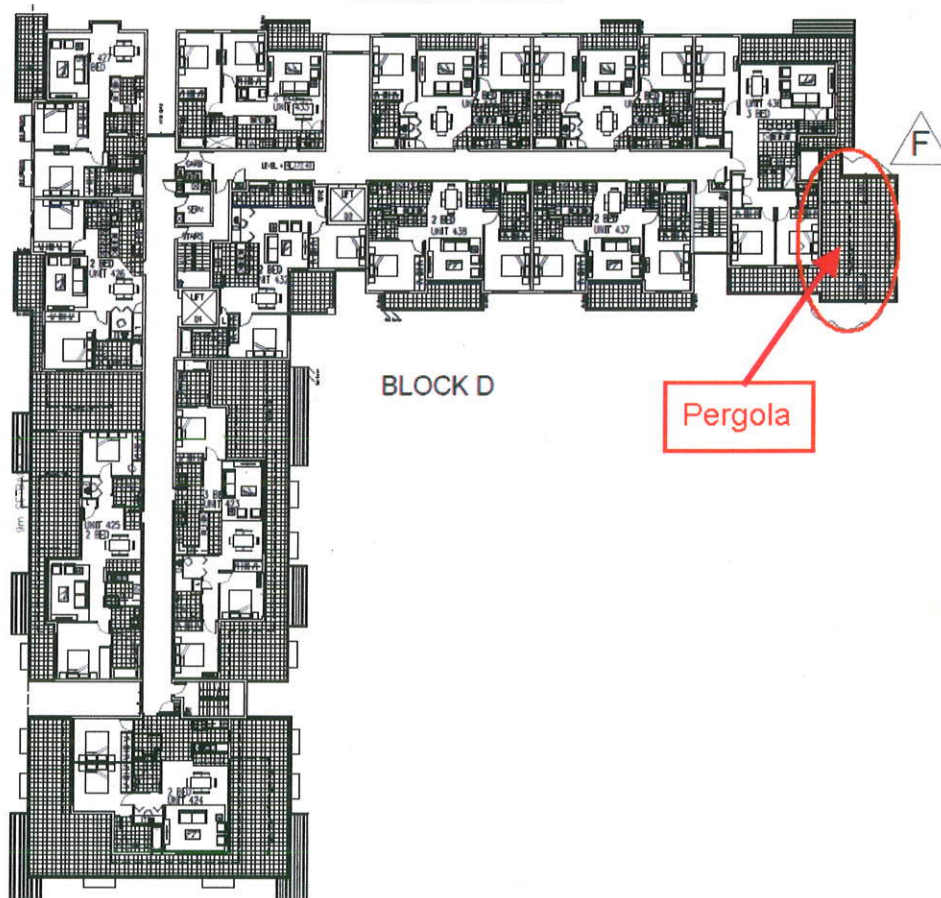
Proposed pergolas for Level 4, Block D (Stage 1 – Level 4 Plan)
